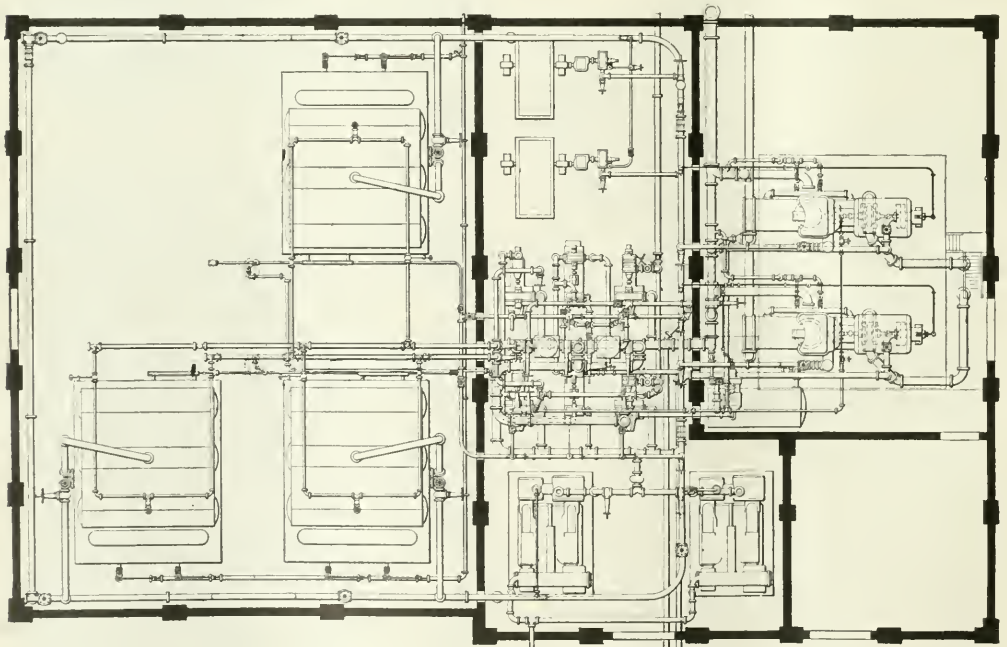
GENERAL LAYOUT OF POWER HOUSE WITH DETAIL OF PIPING
